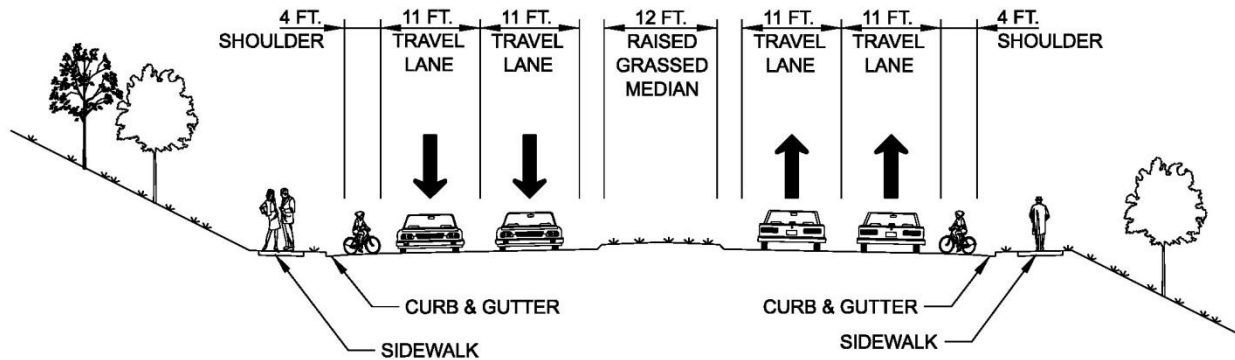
SEGMENT 3A PROPOSED TYPICAL SECTION
